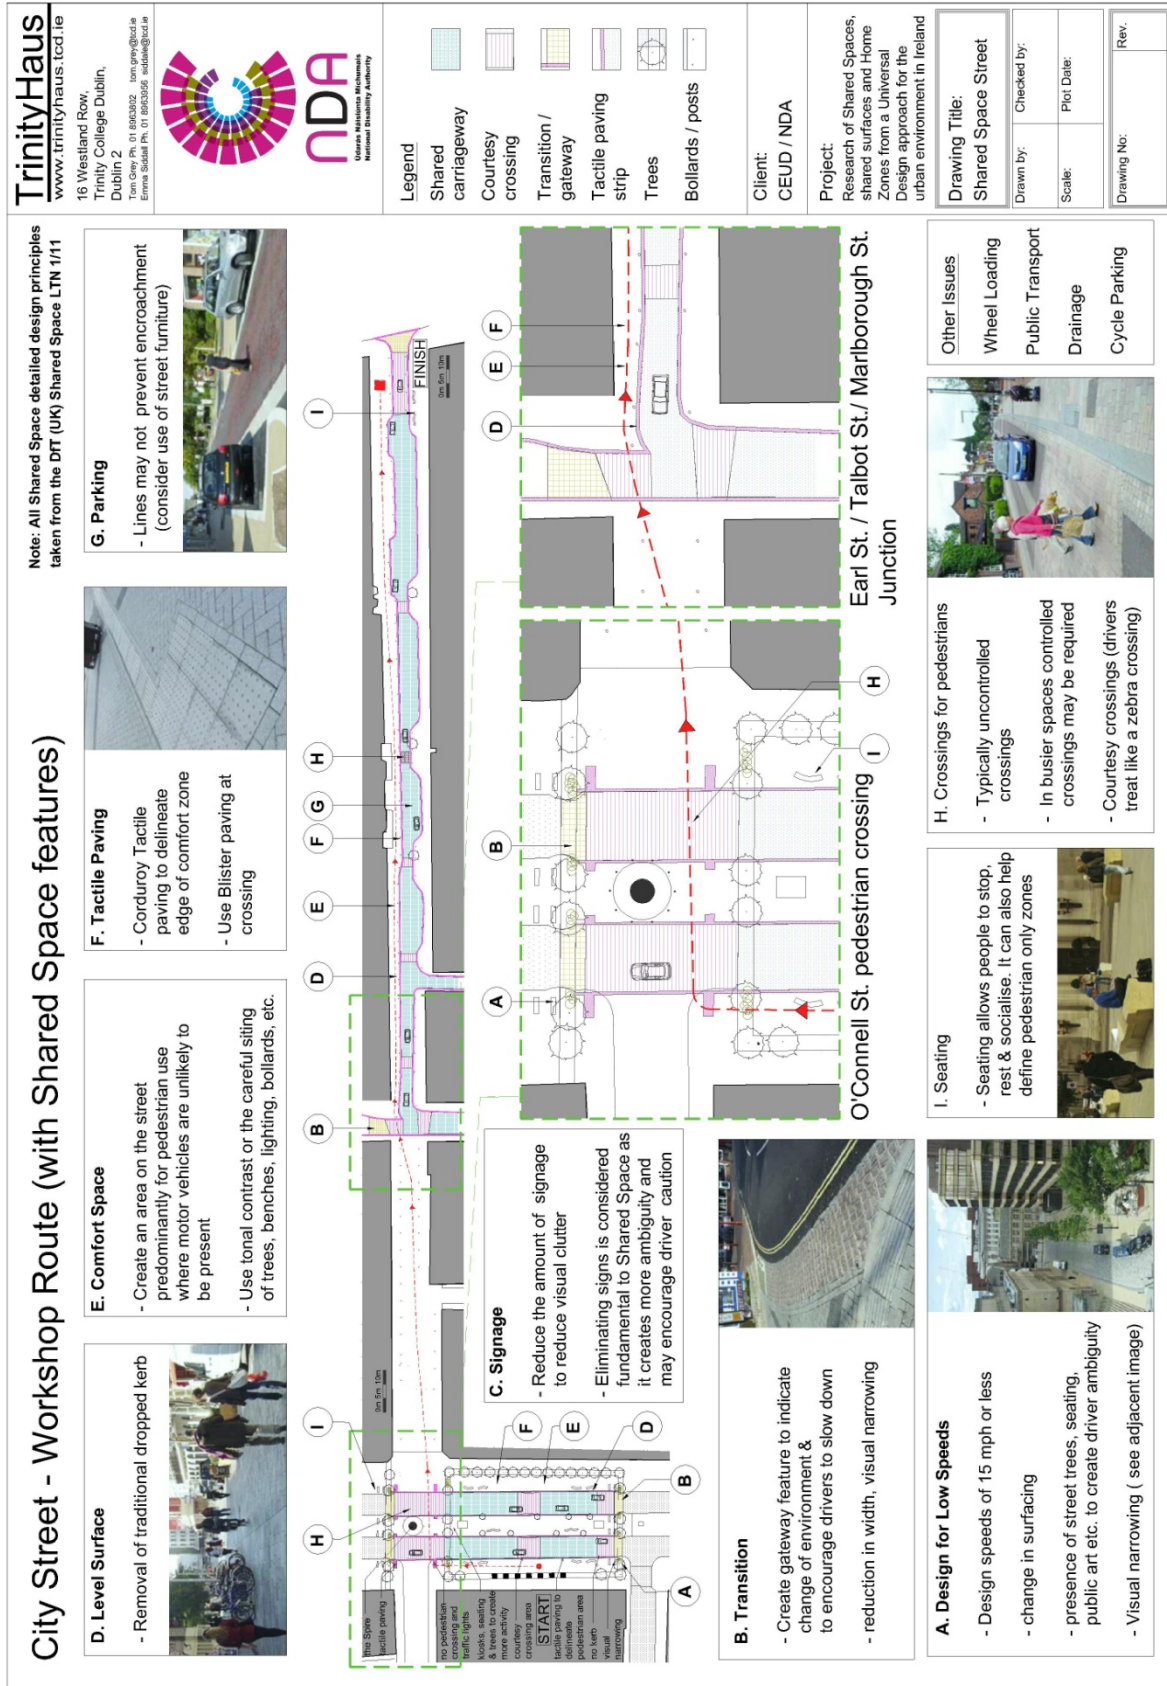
Plan drawing & photos of the Shared Space city street route (exercise 2, route 1)
